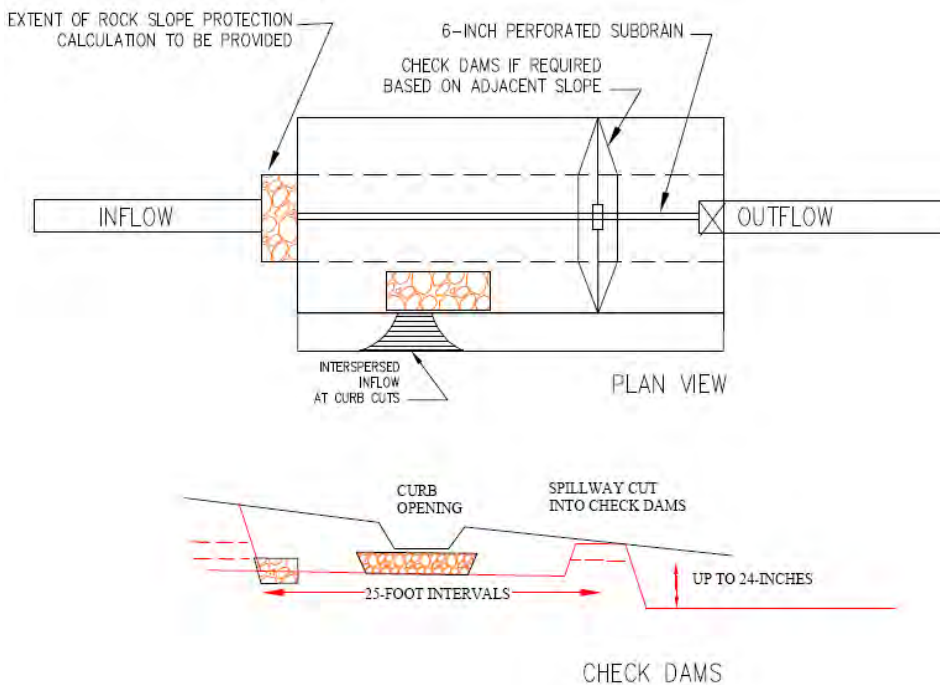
Check dam (plan view and profile) for installing a series of linear bioretention cells in sloped area
